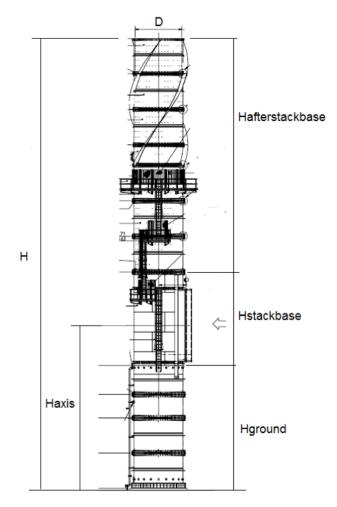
Technical representation of the investigated self-bearing with its geometrical constraints.
